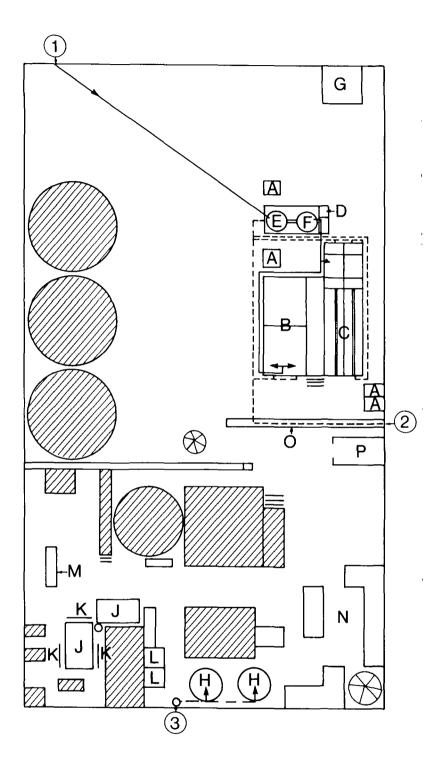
GENERAL LAYOUT OF PILOT PLANT FACILITY
